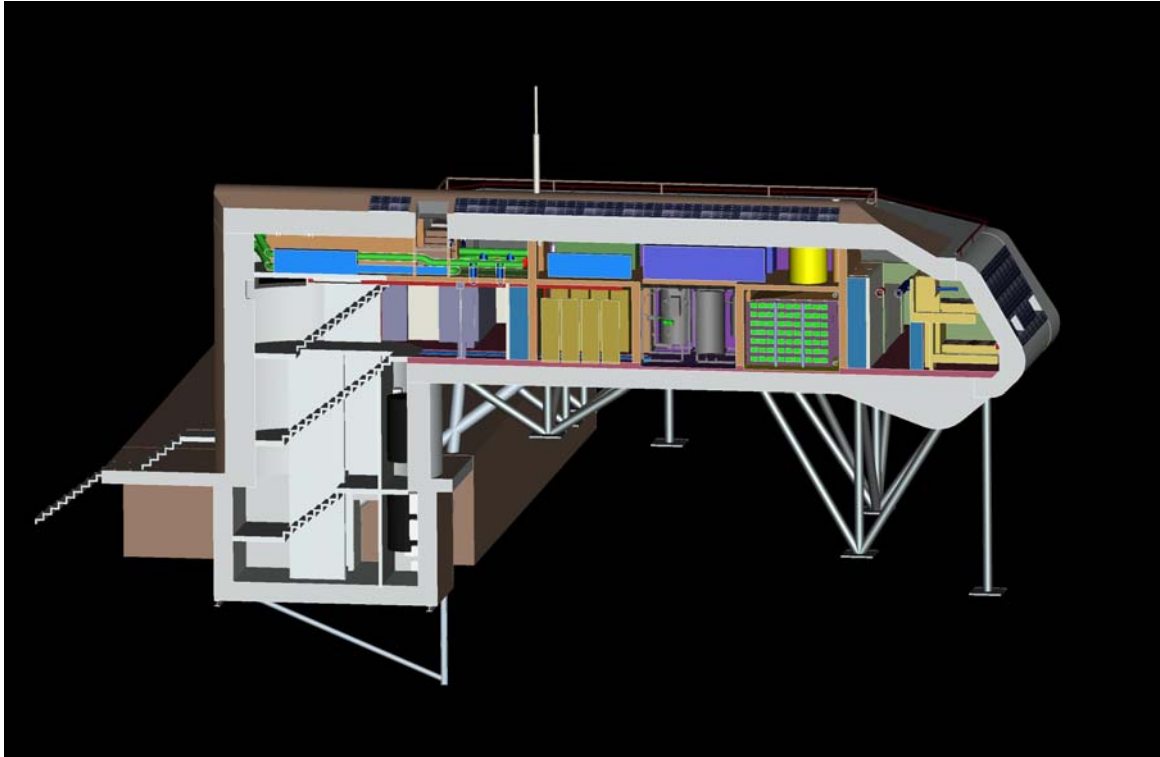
Building concept: main building and connection to garage/storage building.
